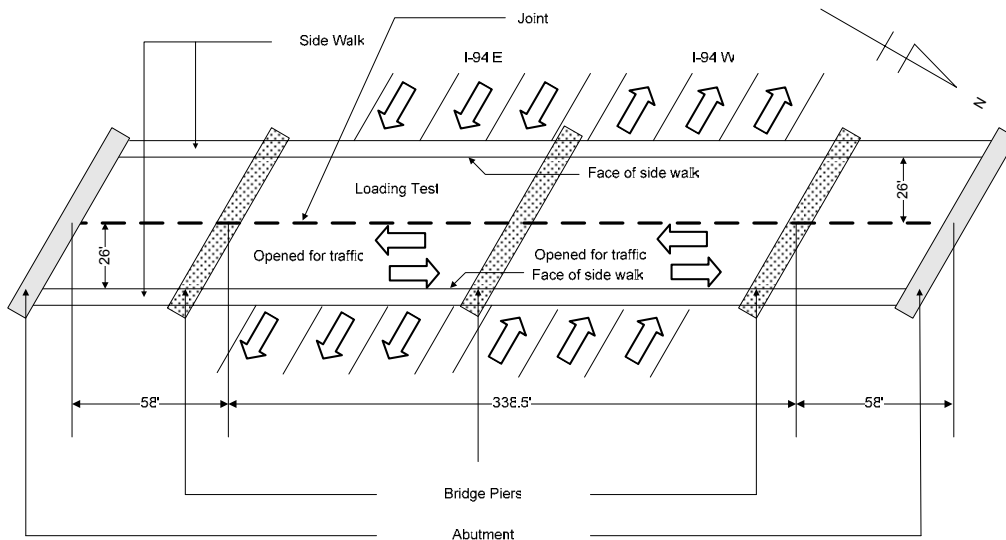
Plan view of bridge span loaded on October 29, 2005
